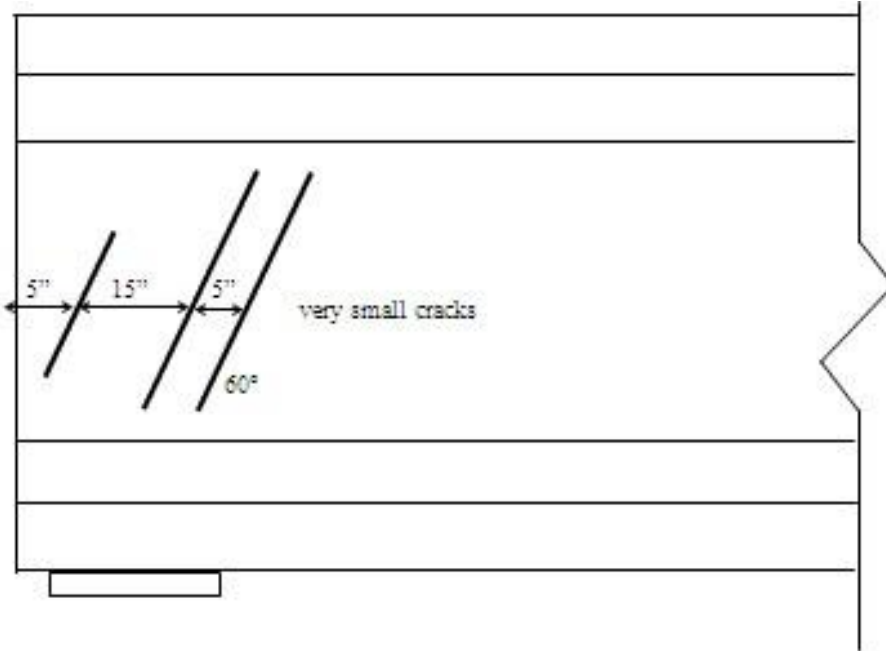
Crack diagram for exterior girder on east side, interior face, north abutment (#3849).
